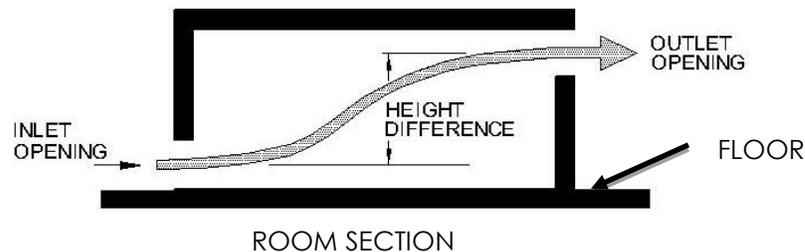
ARRANGEMENT OF OPENINGS IN WALLS FOR ENHANCED VENTILATION
